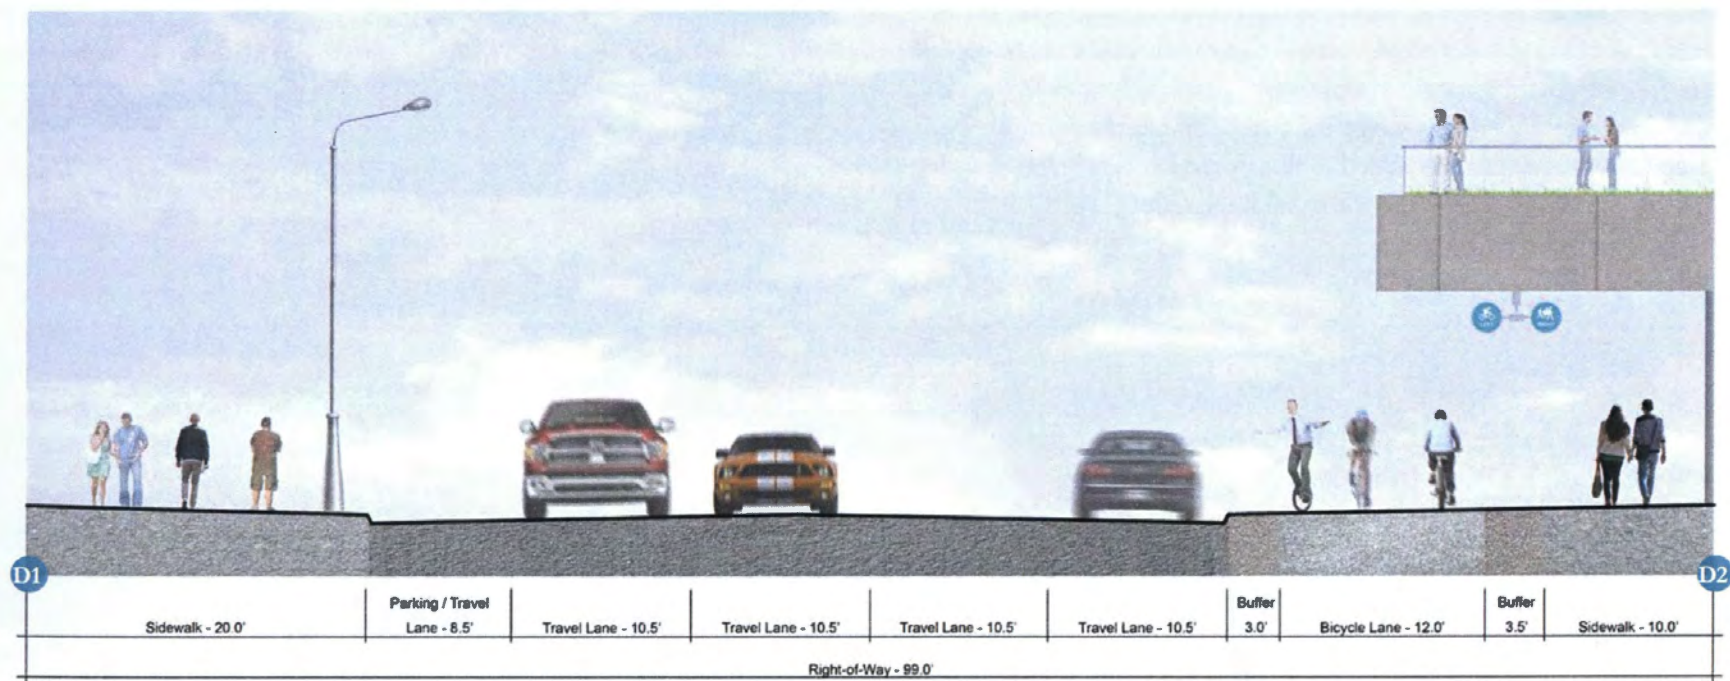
Lakeside Avenue between E Mall Dr and W Mall Dr Proposed Section
